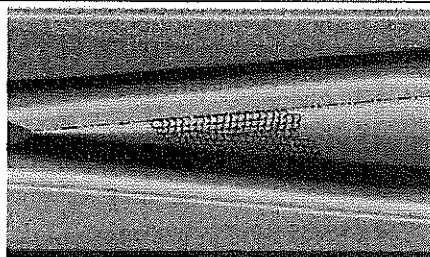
Build-up welding, worn area reaches running edge
